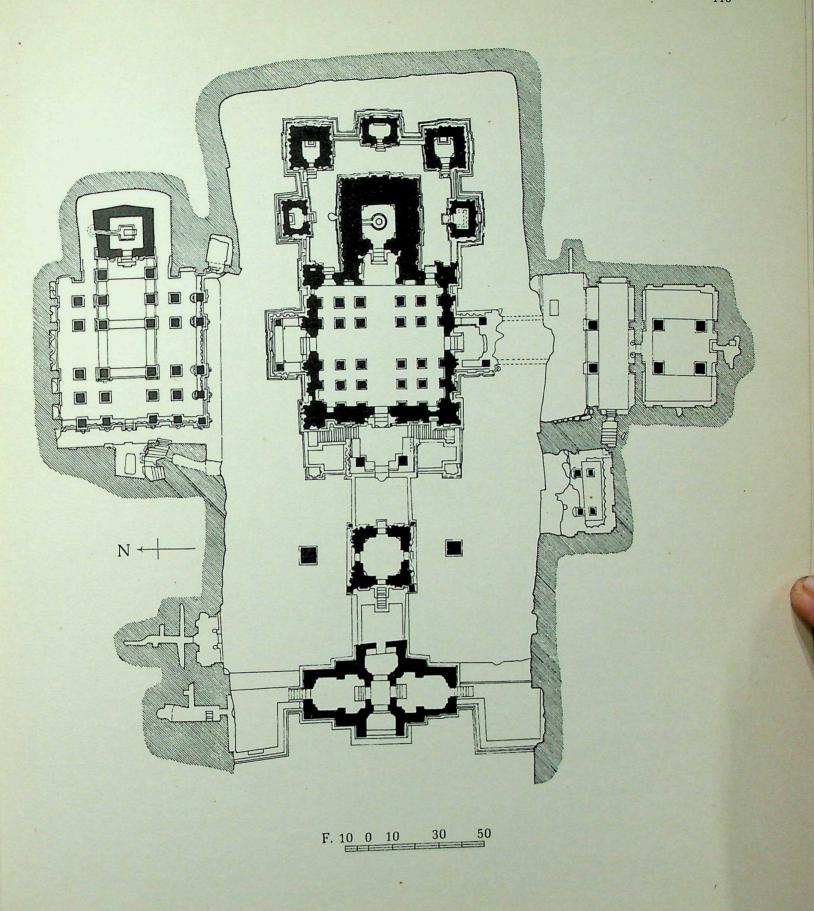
Éllőrã. Kailāsa temple, plan, upper section. (After Burgess.)
